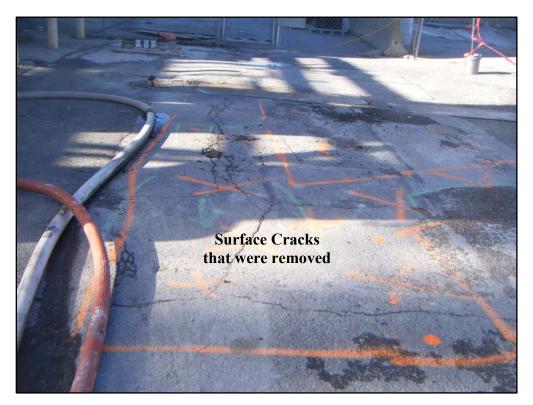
Photograph (3) SU13 Surface Cracks Removed
